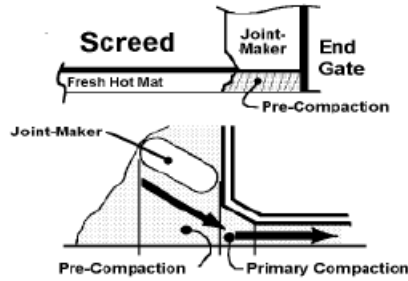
Longitudinal joint construction with a joint maker (22)
